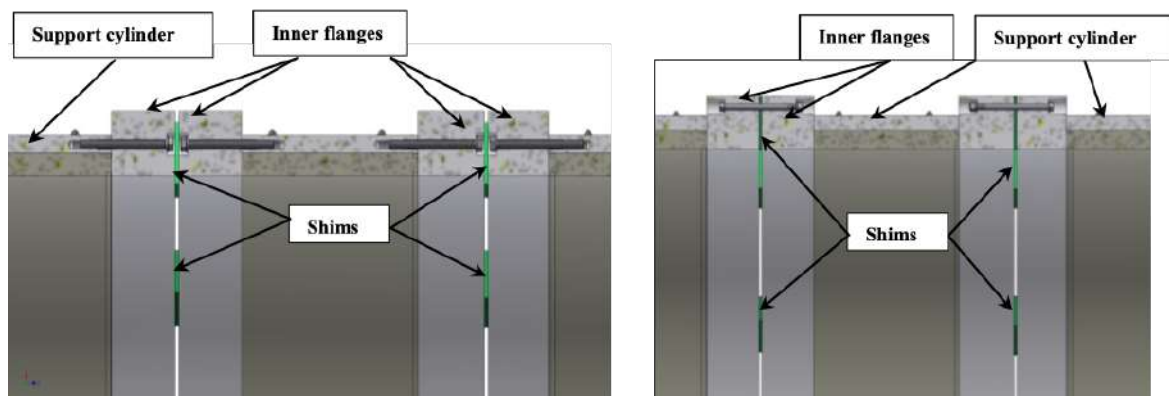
Connections "inner flanges – support cylinder" (left) and "inner flange – inner flange" (right).
